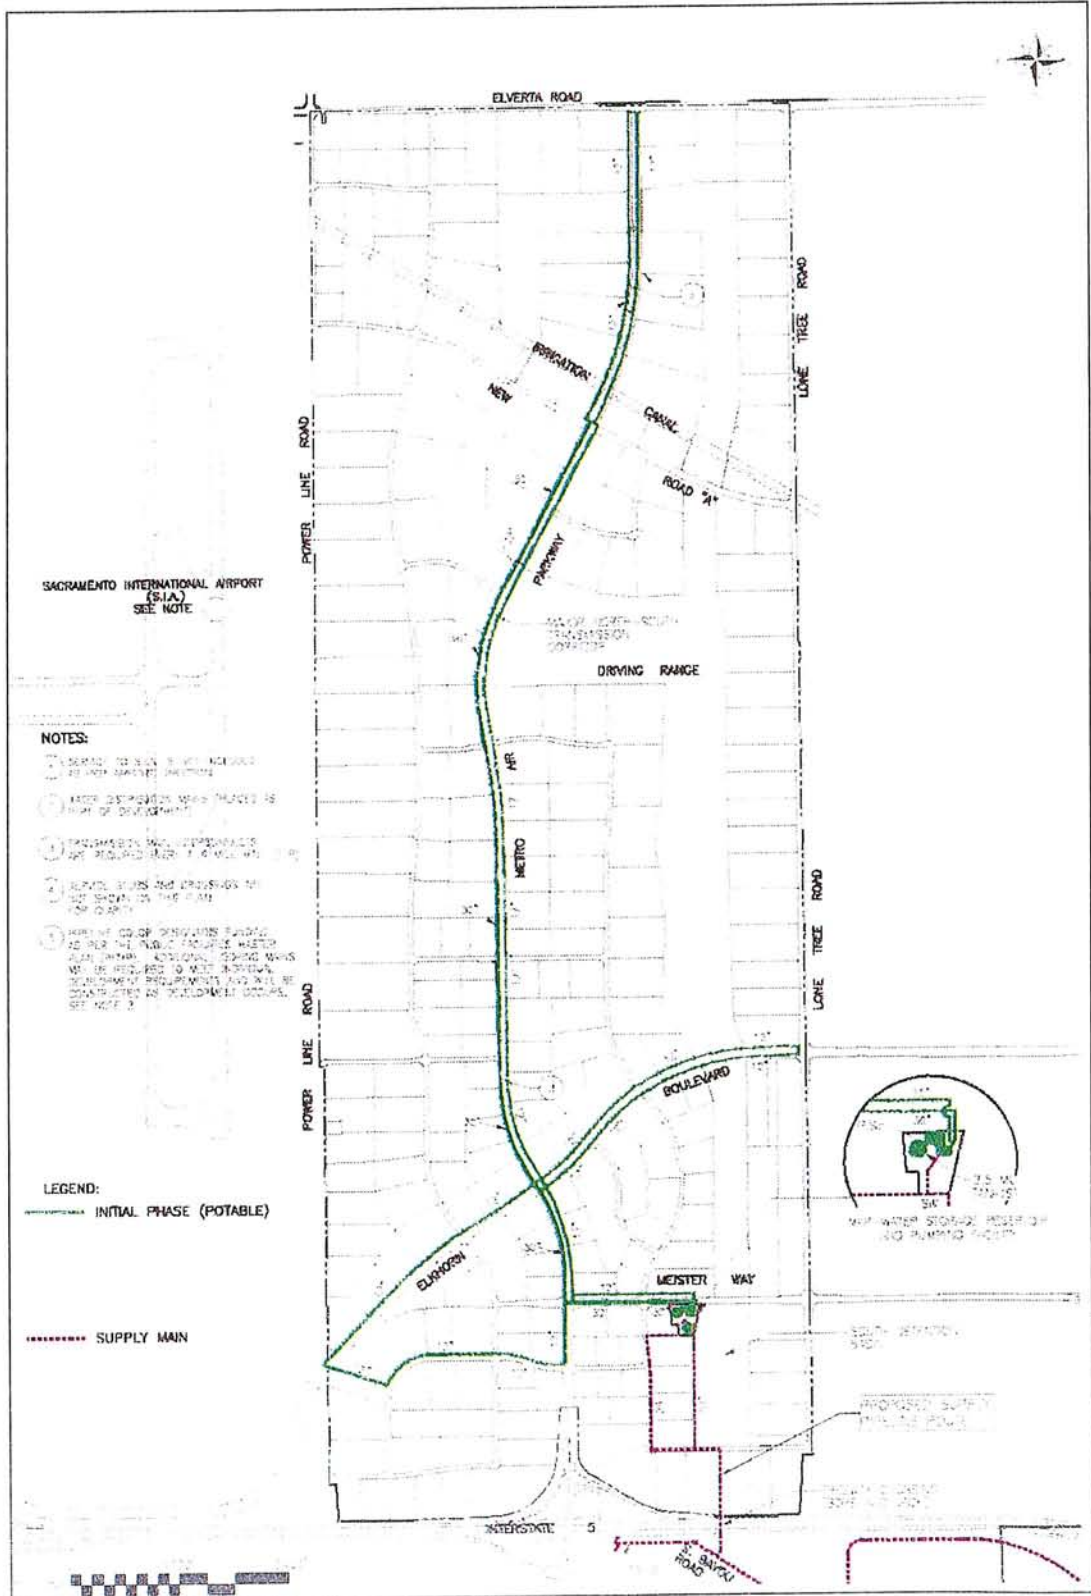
PHASE 2 – WATER FACILITIES PHASING PLAN
